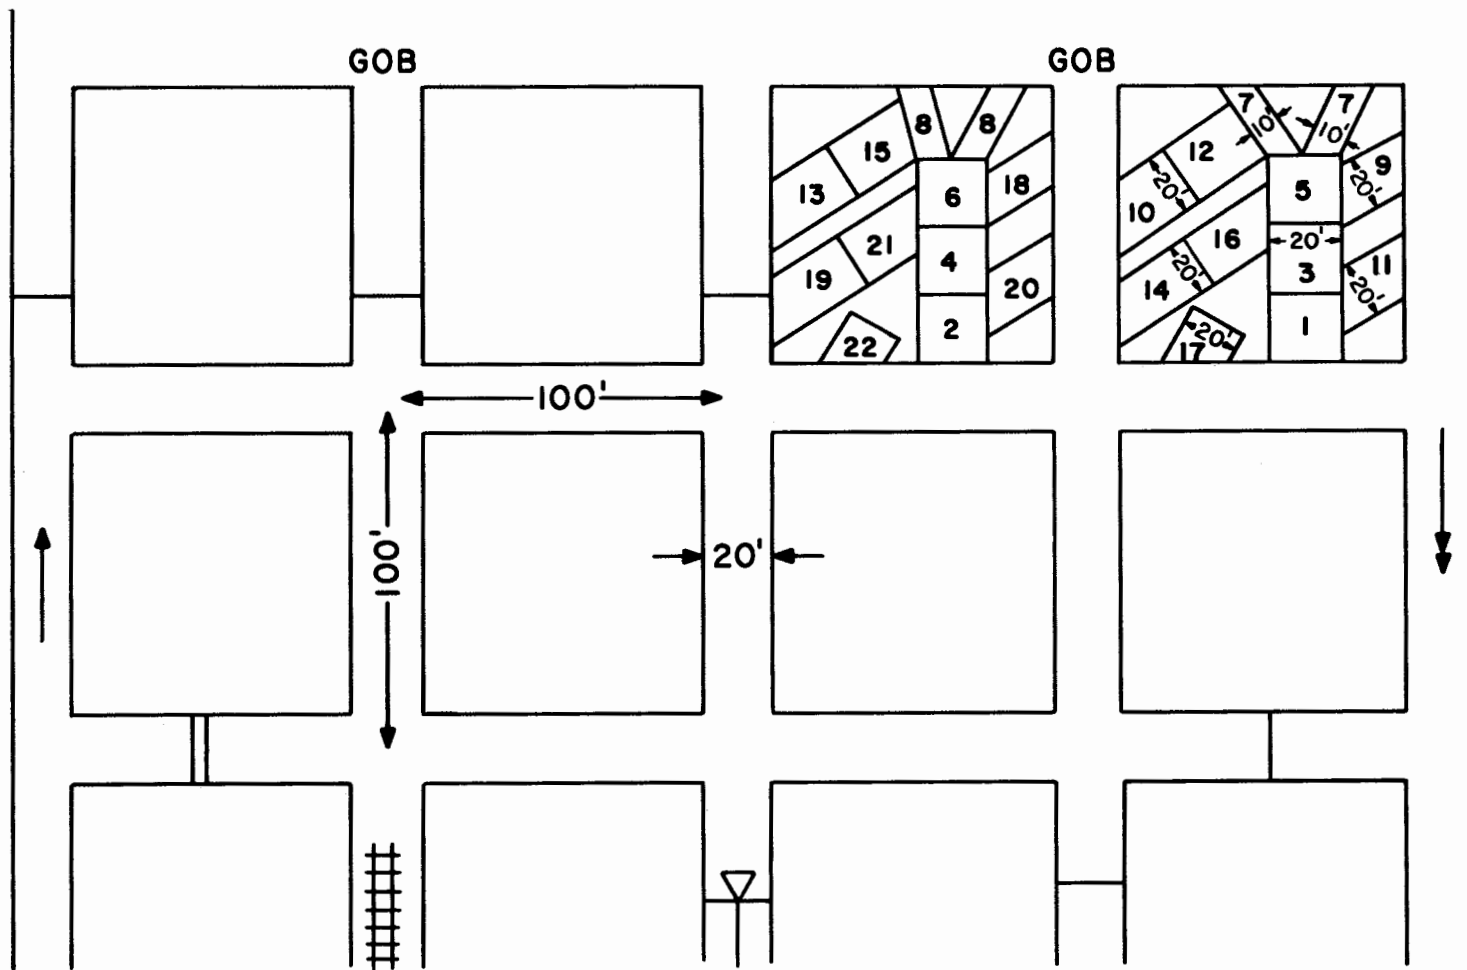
PILLARING PLAN, MOSS NO. 3 MINE
